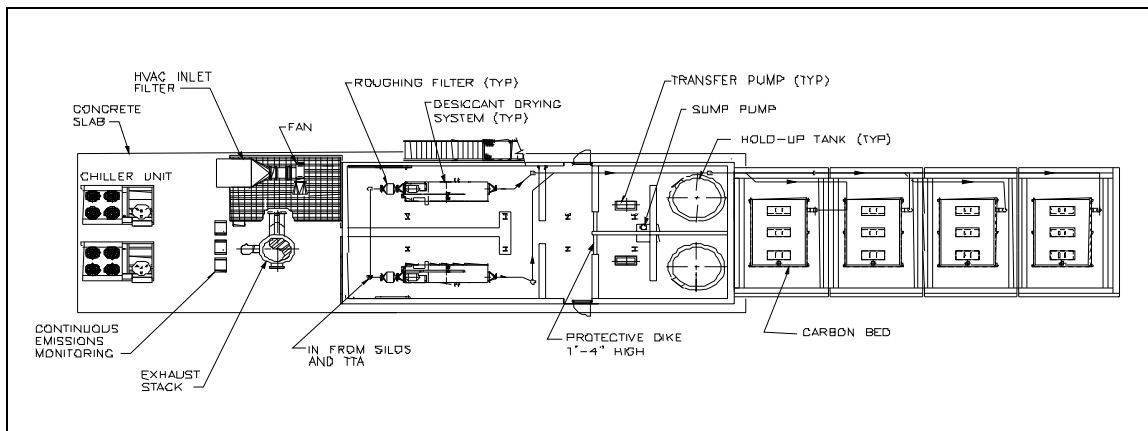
Radon Control System Air Flow Pattern – 1st Floor Plan
